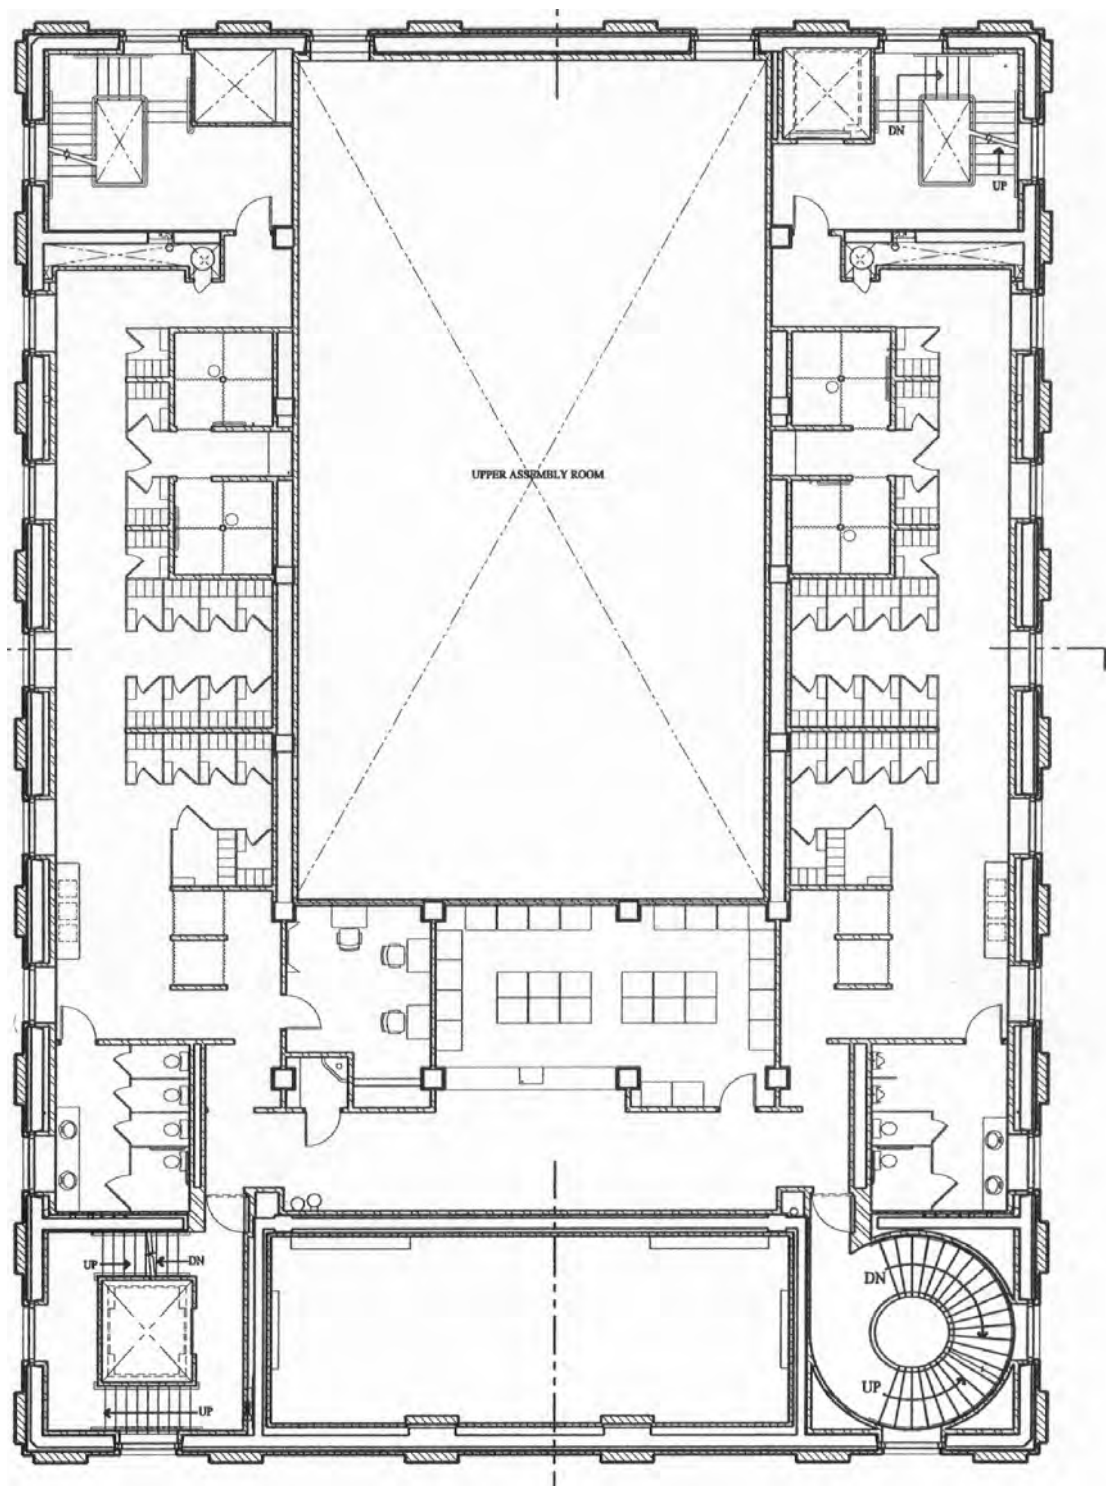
Main floor mezzanine plan of the new Nauvoo temple. Compare with original plans of the main floor mezzanine on Figure 6. Courtesy FFKR Architects.
